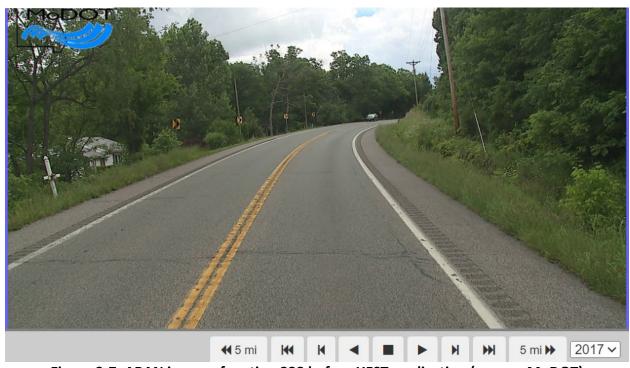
ARAN image of section 238 before HFST application (source: MoDOT)
